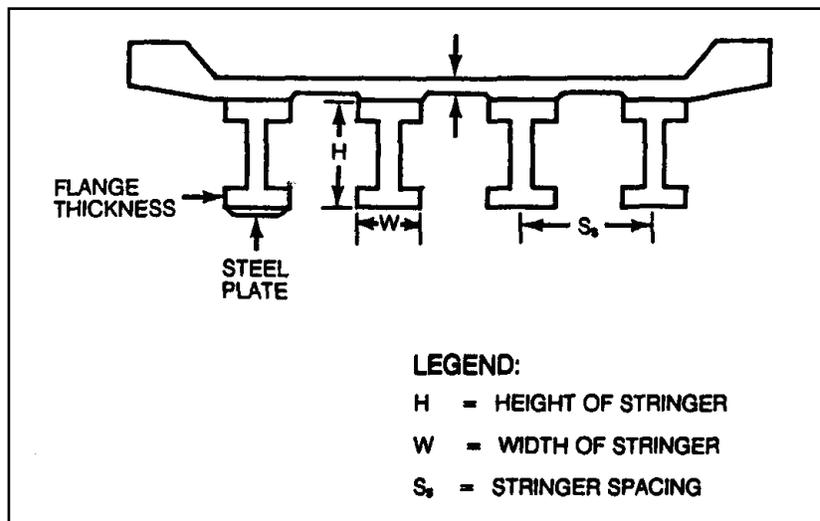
Composite steel-concrete stringer MLC 70 bridge
